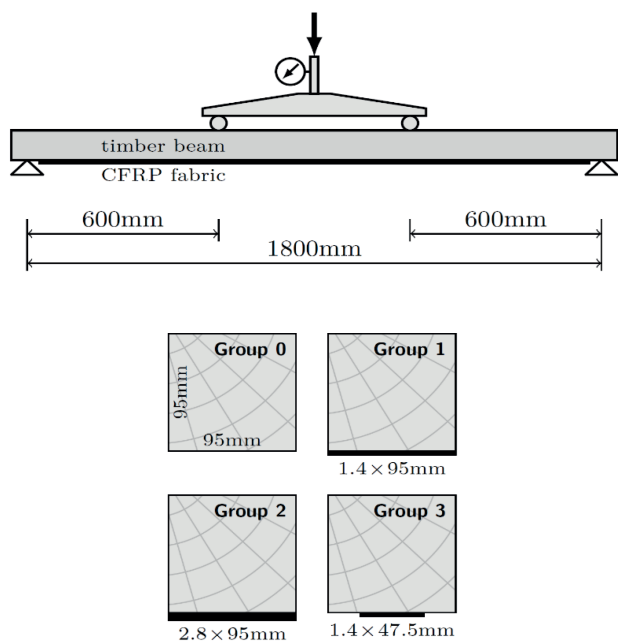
Sketch of test arrangement and cross-sections with various reinforcement types.
